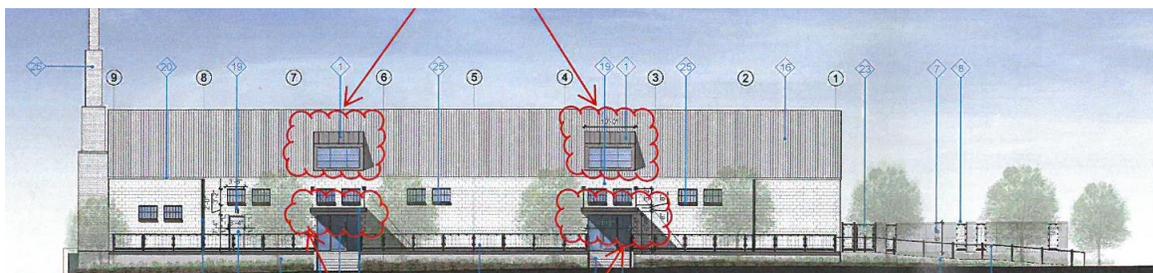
Approved LAC drawings, East Elevation, 2016. Note indicates corrugated galvanized roofing on the new dormers and construction of canopies at the entrances.
